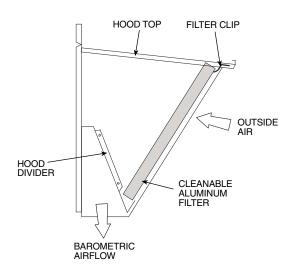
Filter Installation (3 to 12¹/₂ Ton Units)
